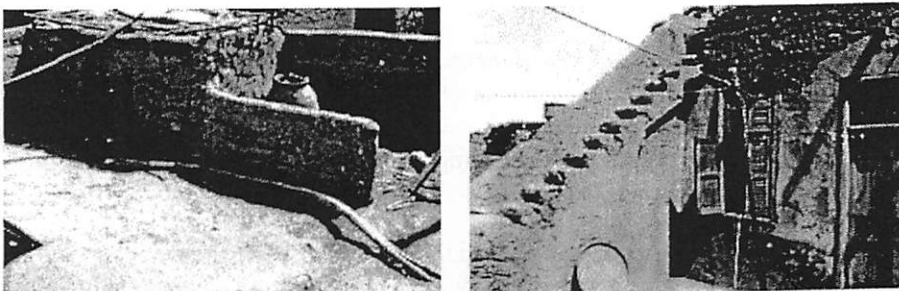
khedr house roof as an example of old house's Roofs (Source: authors)
